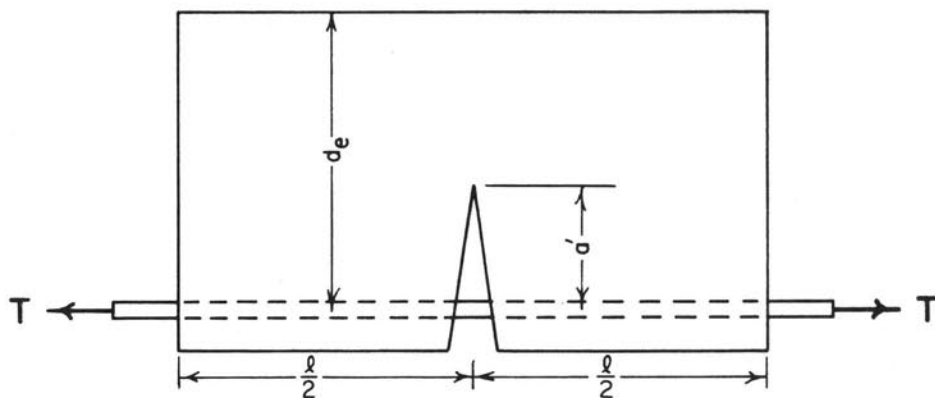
REINFORCED CONCRETE TENSION MEMBER
